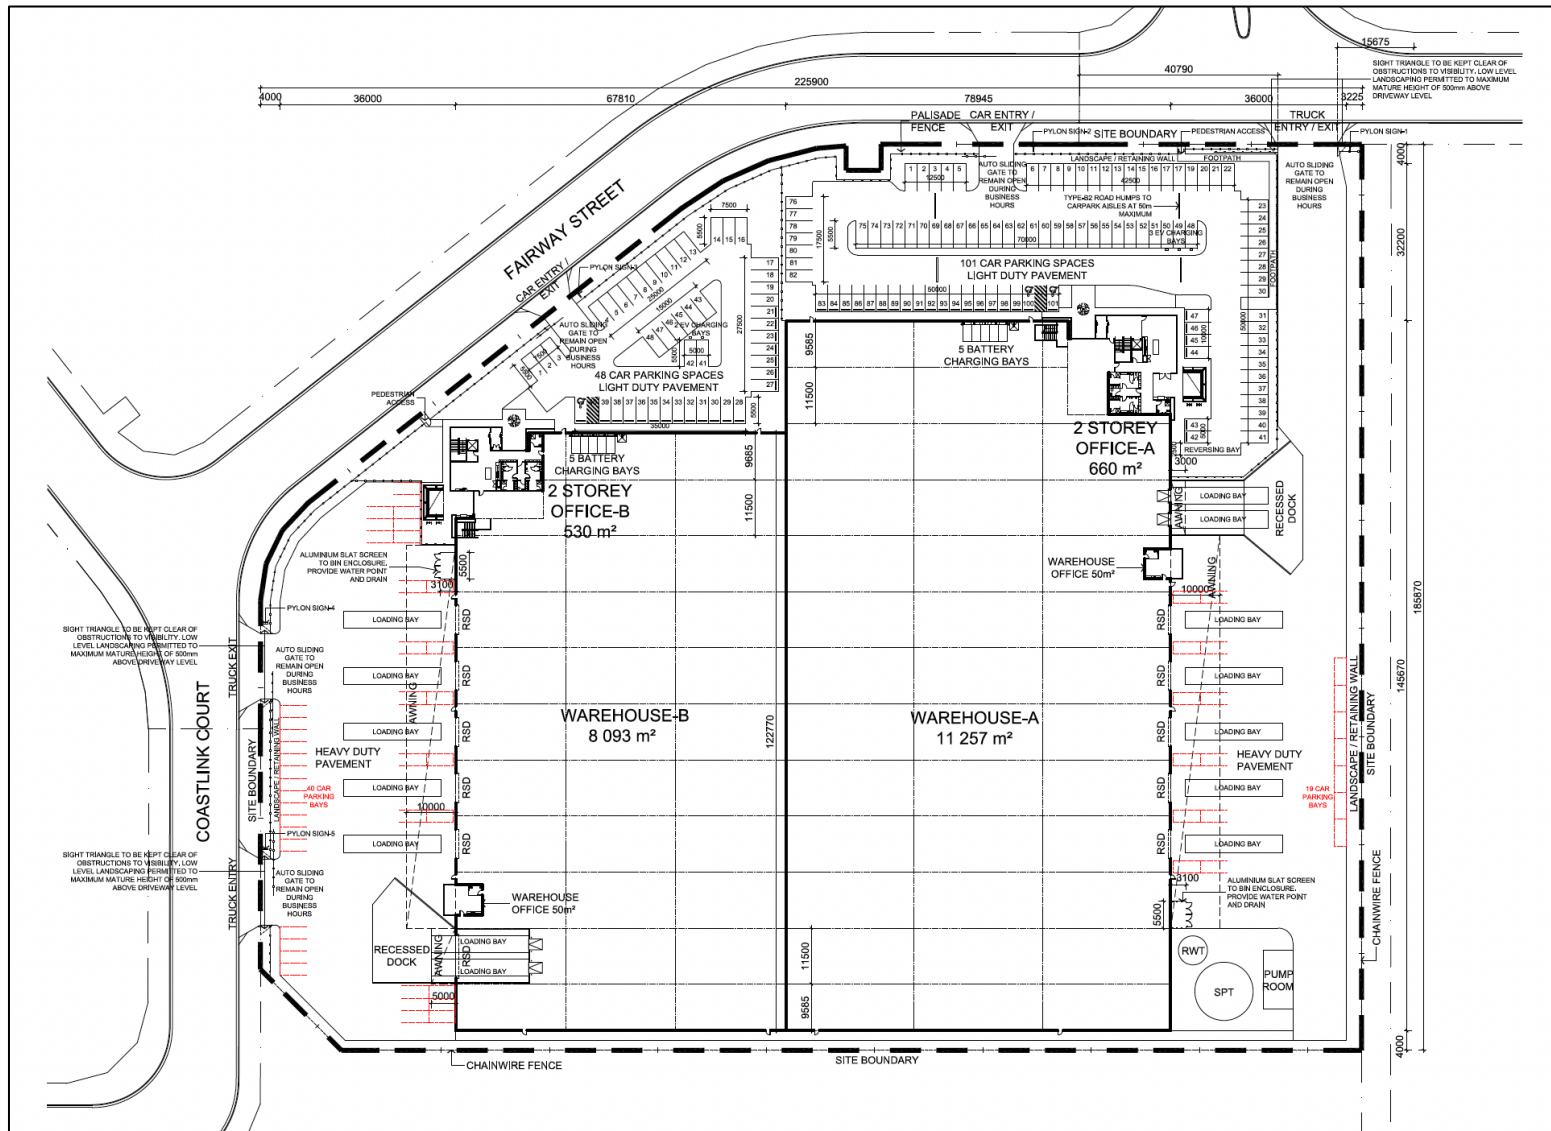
PROPOSED CONCEPT PLAN OF ADDITIONAL OFF-STREET PARKING
